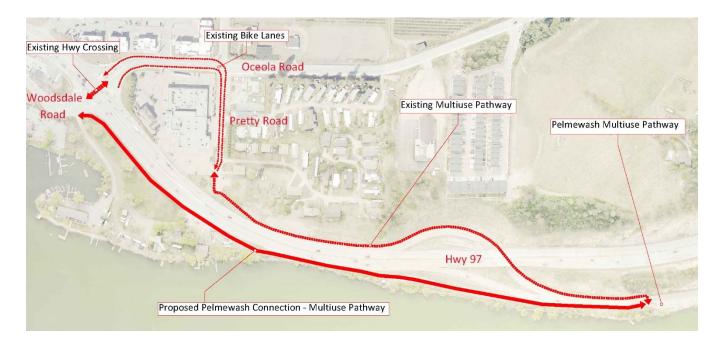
Plan of the Woodsdale Road to Pelmewash Parkway Connection
